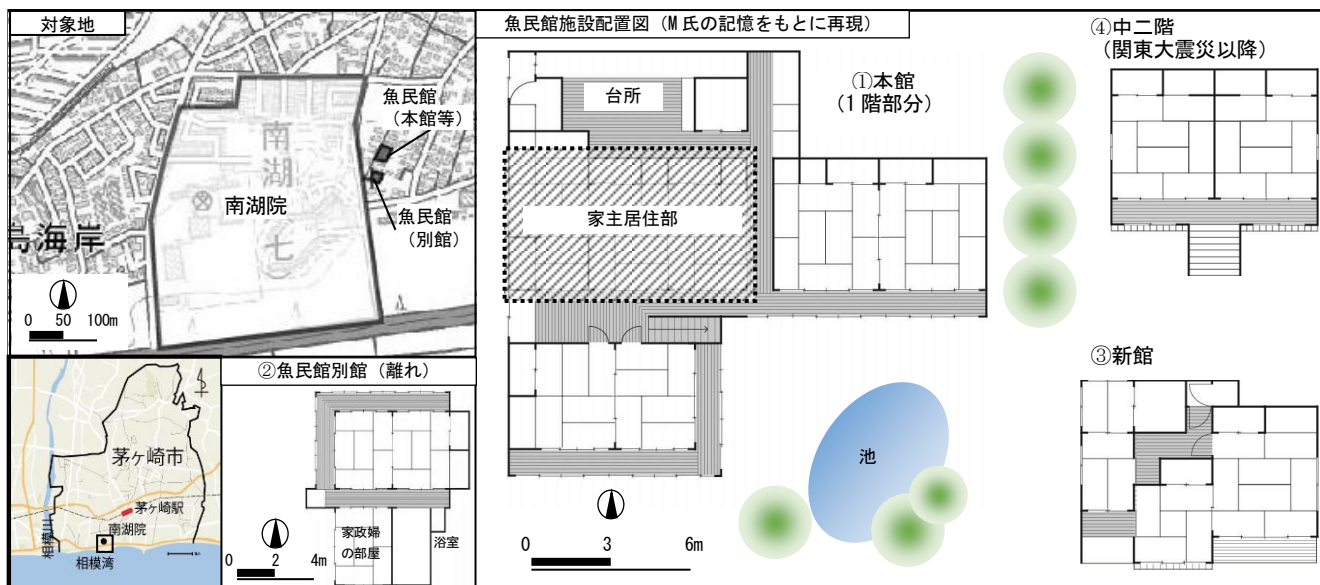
Overview and Facility Layout of Uotamikan (魚民館の概況及び施設配置図)
